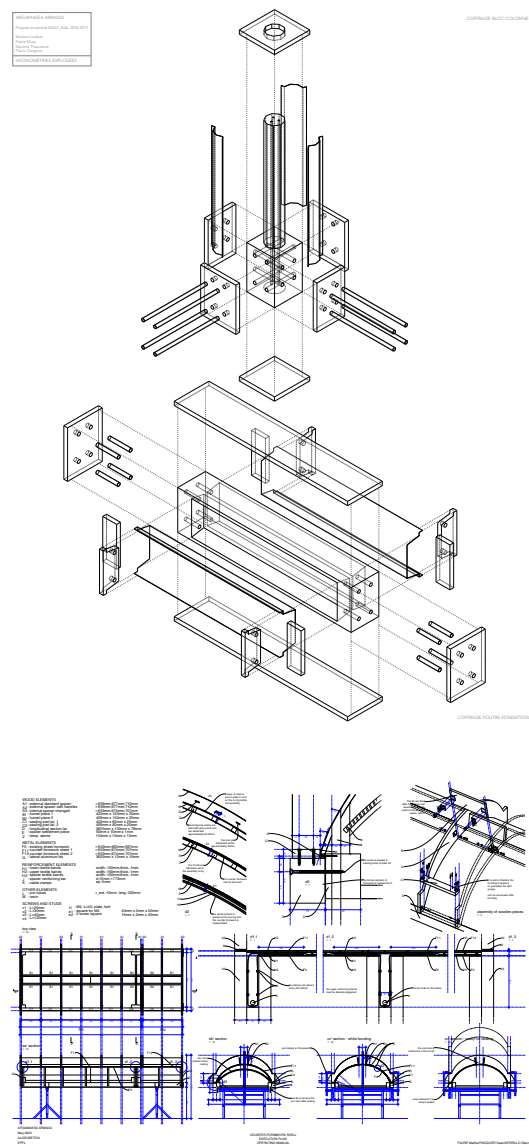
/ 3.8 Drawing of mold of foundation beam with connection details / drawing of mold of barrel shell vault; ENAC UE Argamassa Armada 2019 / 2021
